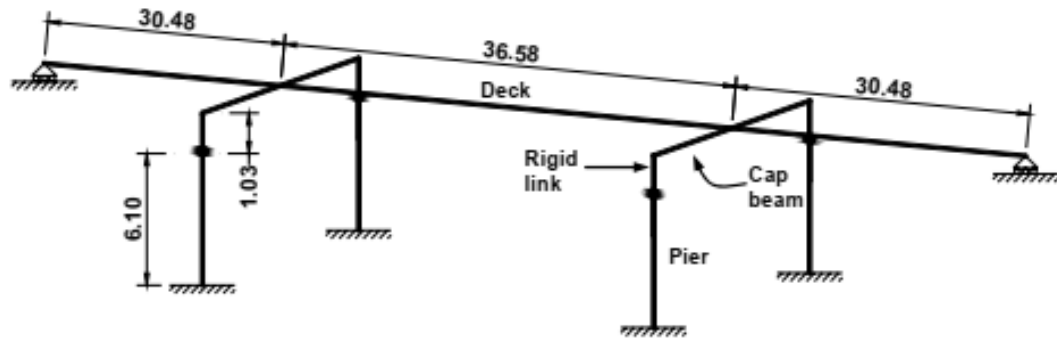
The FHWA Bridge #4 considered in [7] with two-columns framed piers.
